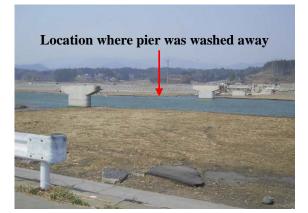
Washed-away pier (Rte. 45, Koizumi Bridge, Kesennuma City, Miyagi Pref.)
